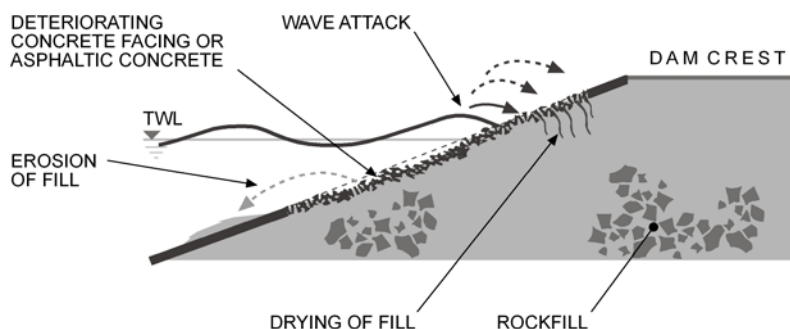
Deterioration of concrete facing or asphaltic concrete.
